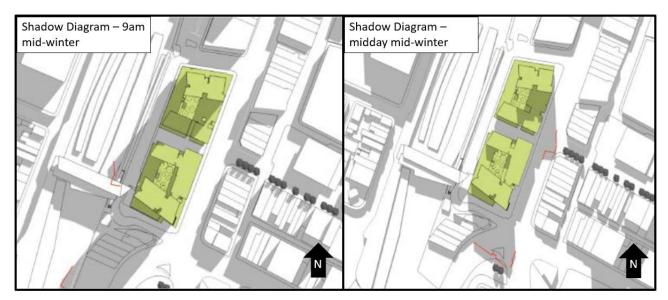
Shadow diagrams at 9am and 12pm on June 21 (source: the planning proposal)
